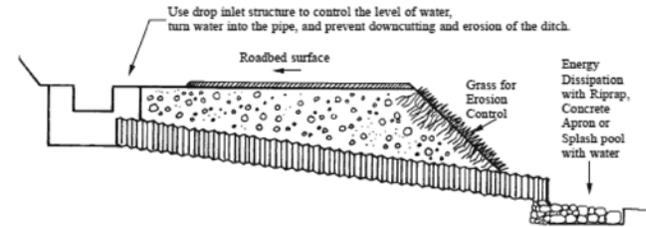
Typical drop inlet structure with culvert cross-drain (Keller and Sherar 2003).
